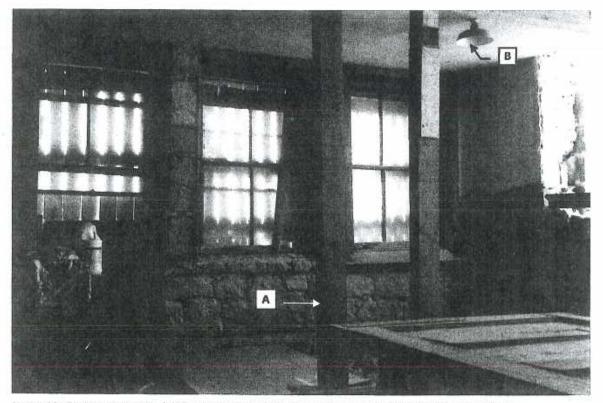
Room 1 view east. (A) Shoring pier per 2003 structural retrofit, (B) Non-historic metal shade.
